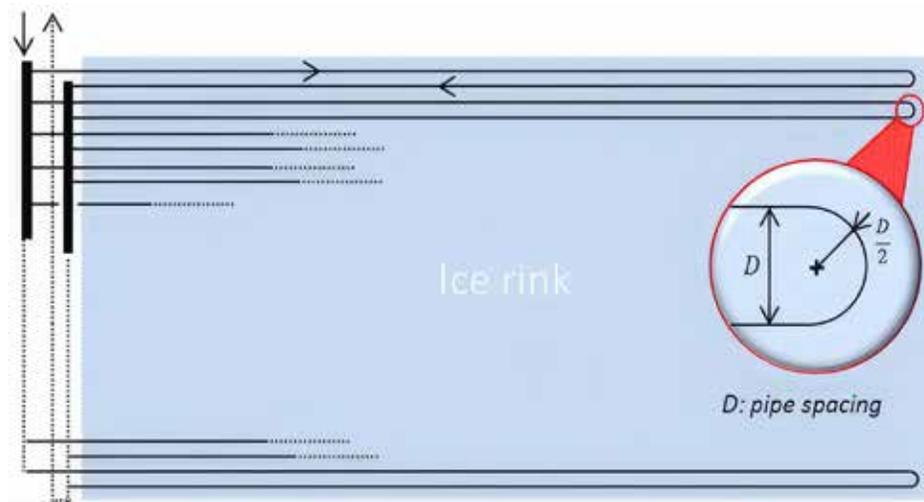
Typical piping layout in Europe with headers on the one short end side.
